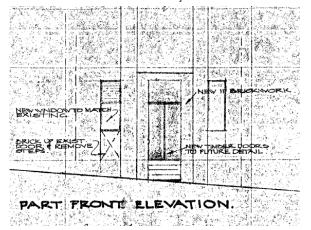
1952 PLAN OF PROPOSED RENOVATIONS FOR USE AS THE MATTHEW TALBOT HOSTEL
